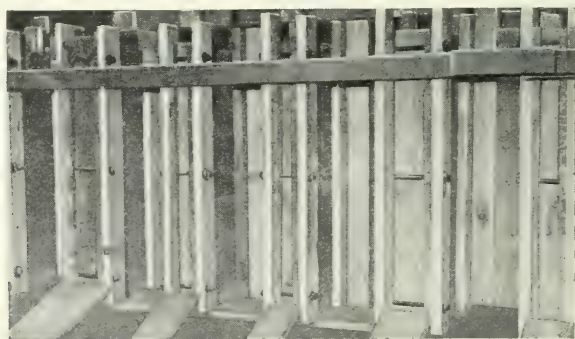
REAR BARRIER FORMS IN PLACE, SHOWING BOLTS FOR CLAMPING THEM
